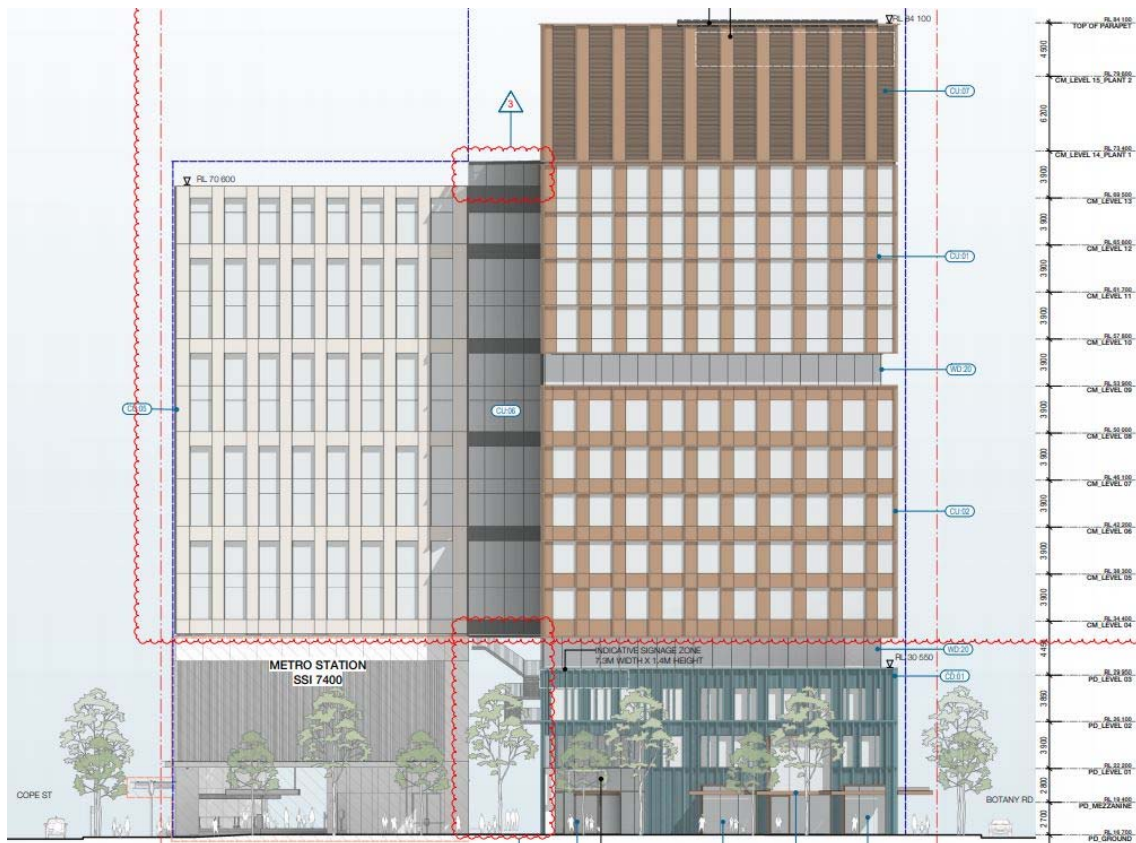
| North Elevation (Raglan Street) (source: Applicant's RtS)
